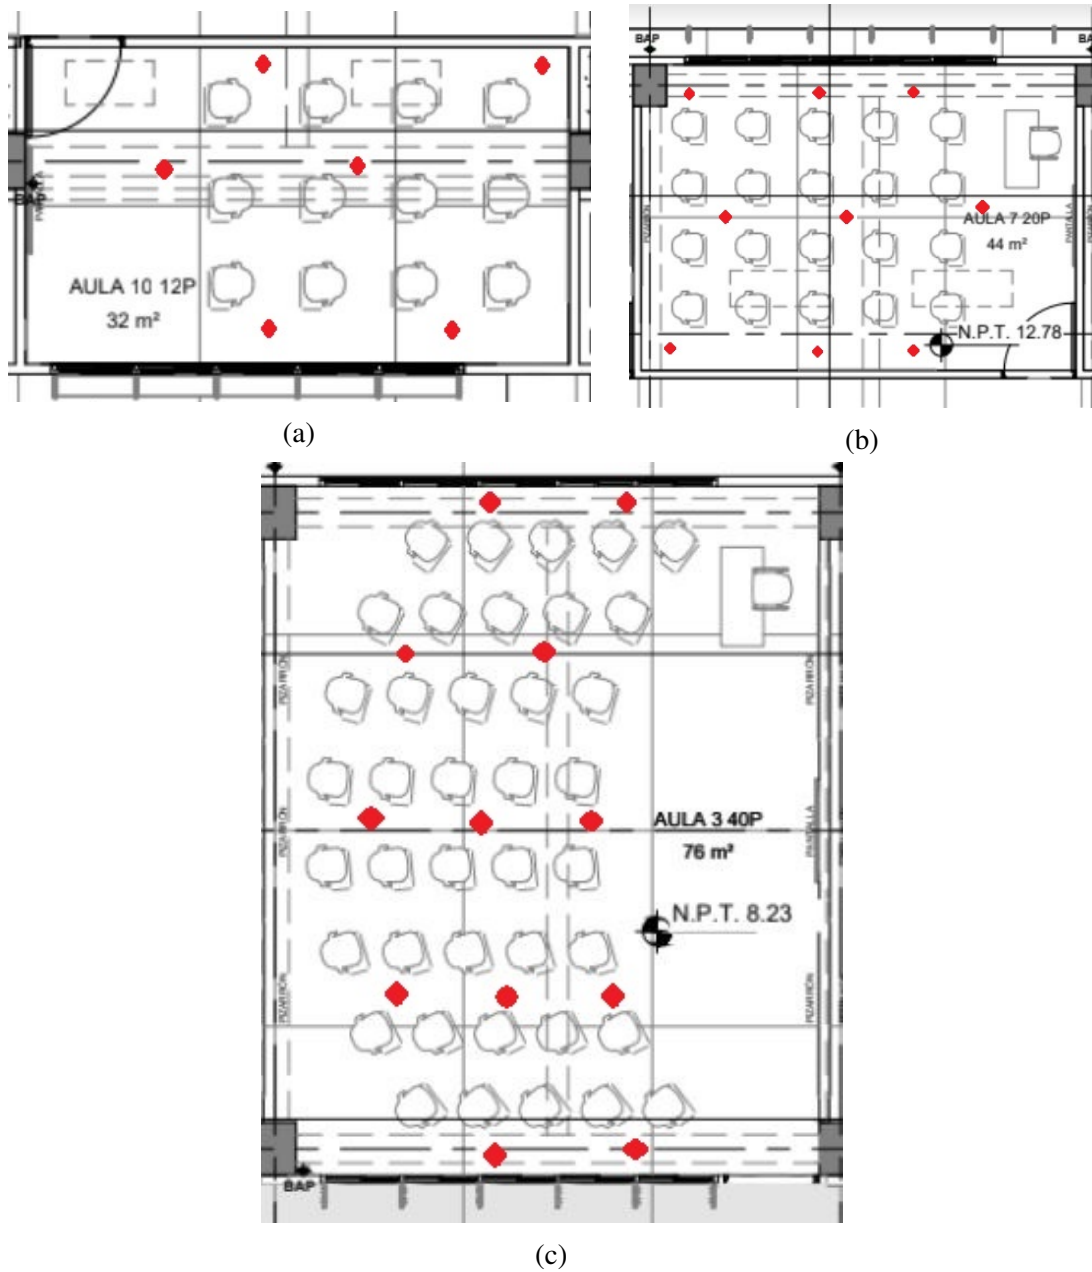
Floor plans of the spaces in the new IER building, the red diamonds show the recommended spots where the measurements should be taken. (a) 10 people space, (b) 20 people space and (c) 40 people space.
